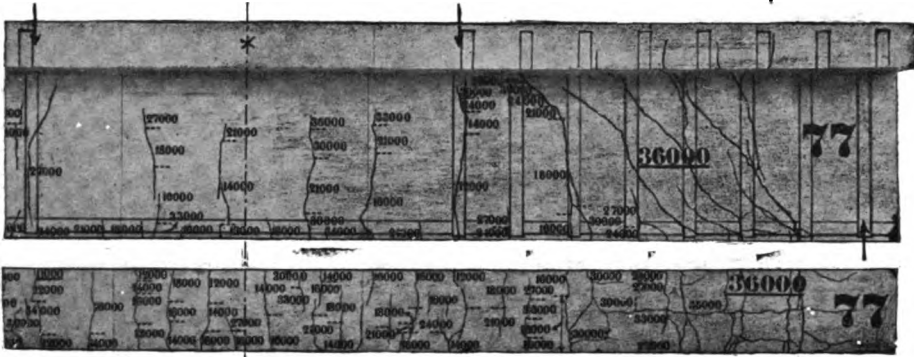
Side view, bottom, and cross-section of beams of T-section with straight reinforcing-rods and stirrups.
